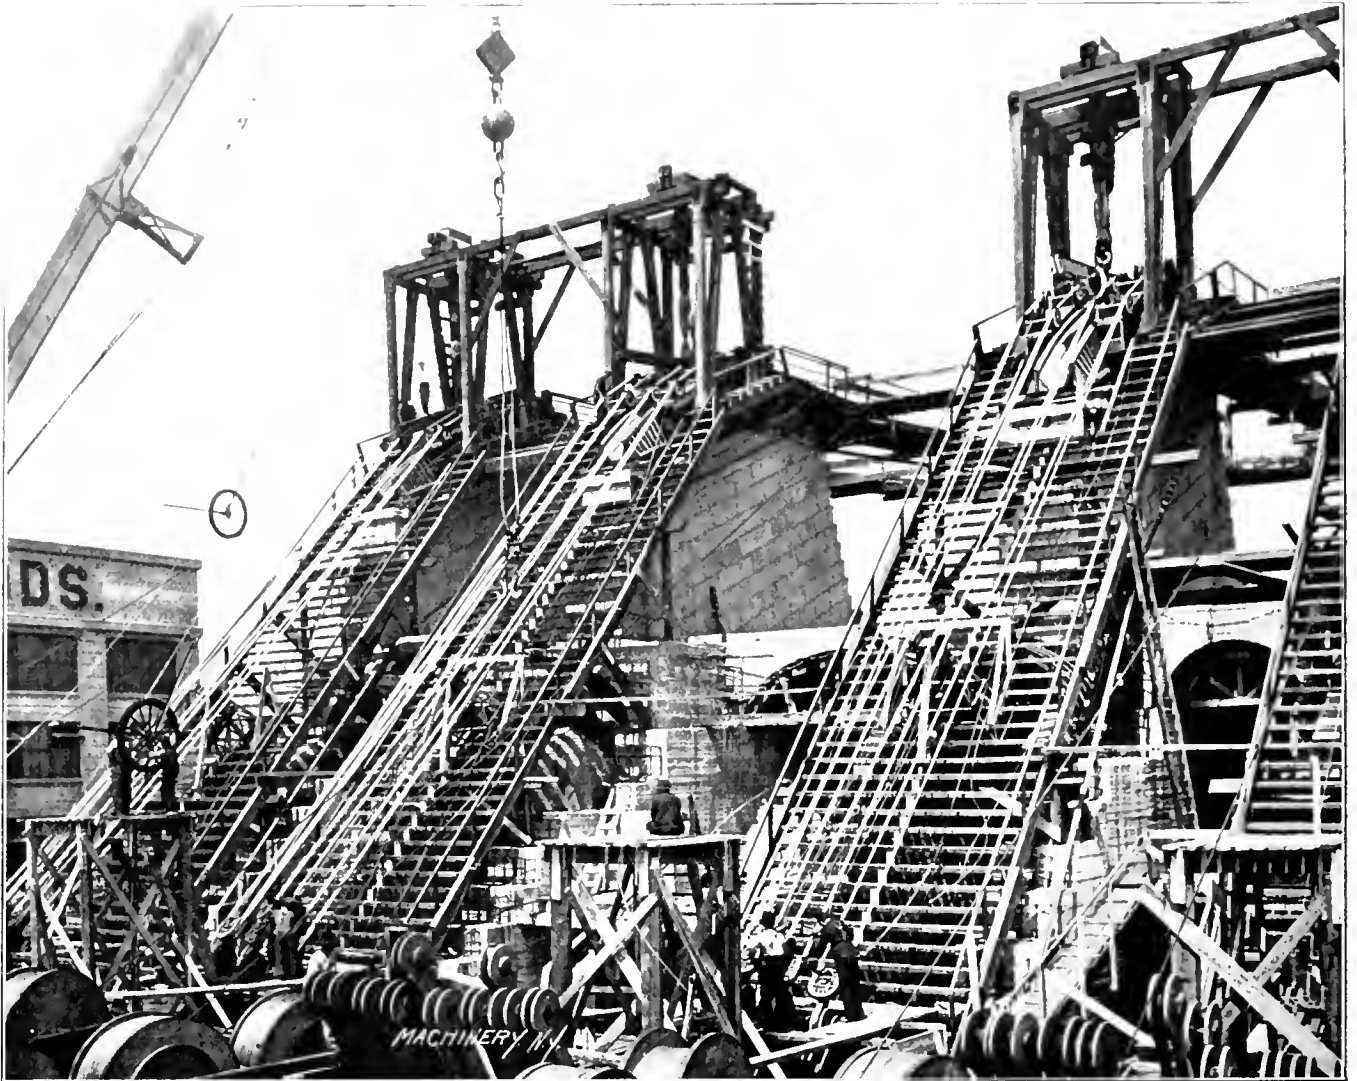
View of One of the Anchorages of the Manhattan Bridge, showing the Strands which are to form the Main Cables, resting in Temporary Saddles.
